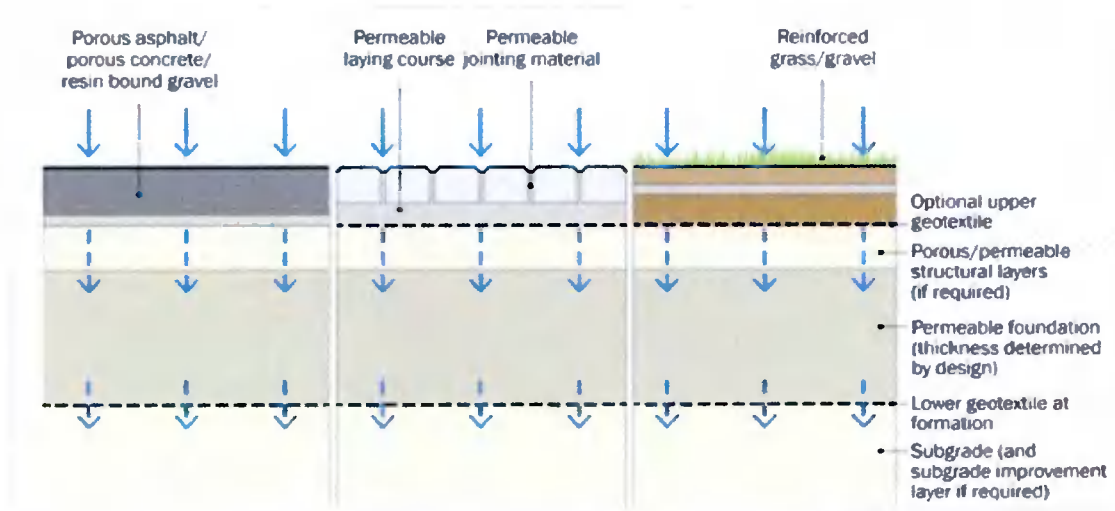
Typical pervious/permeable pavement buildup details.
